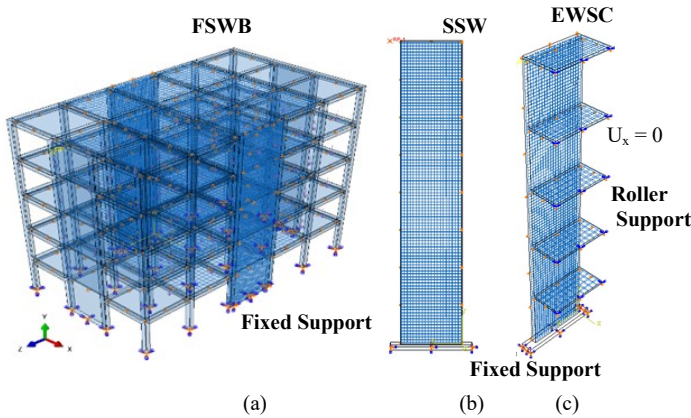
Geometry and boundary conditions of specimens used for pushover analysis: (a) five storied building; (b) isolated slender wall and (c) exterior wall-slab assemblage.
